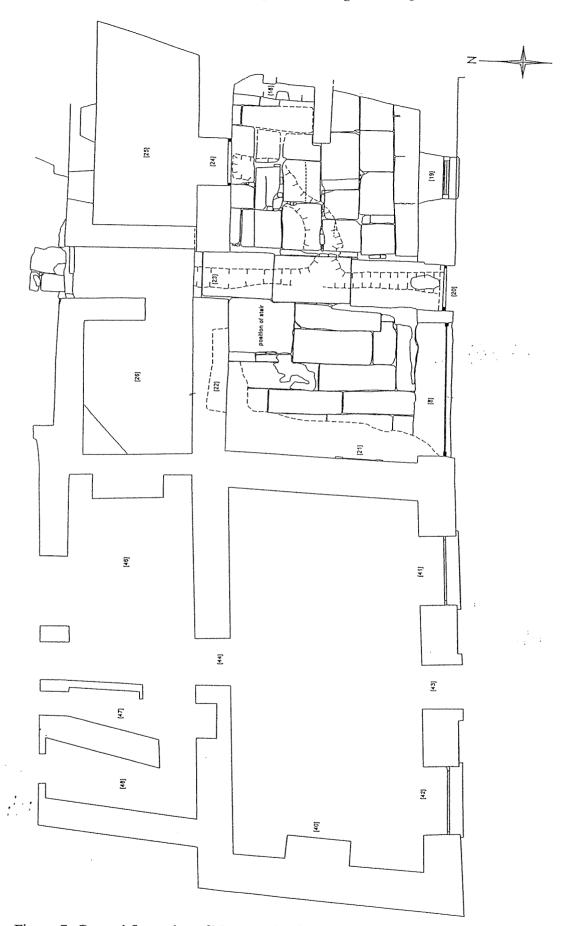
Ground floor plan of Nos.1 and 2 Green Villas
